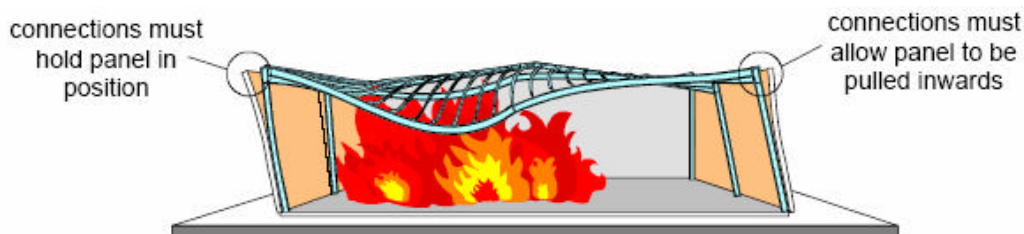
Connections attaching the wall panels to the frame (Bennetts and Poh, 2000)
